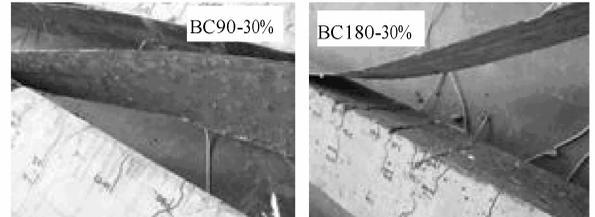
Failure of beams under 30% of initial load and wet-dry cycles
